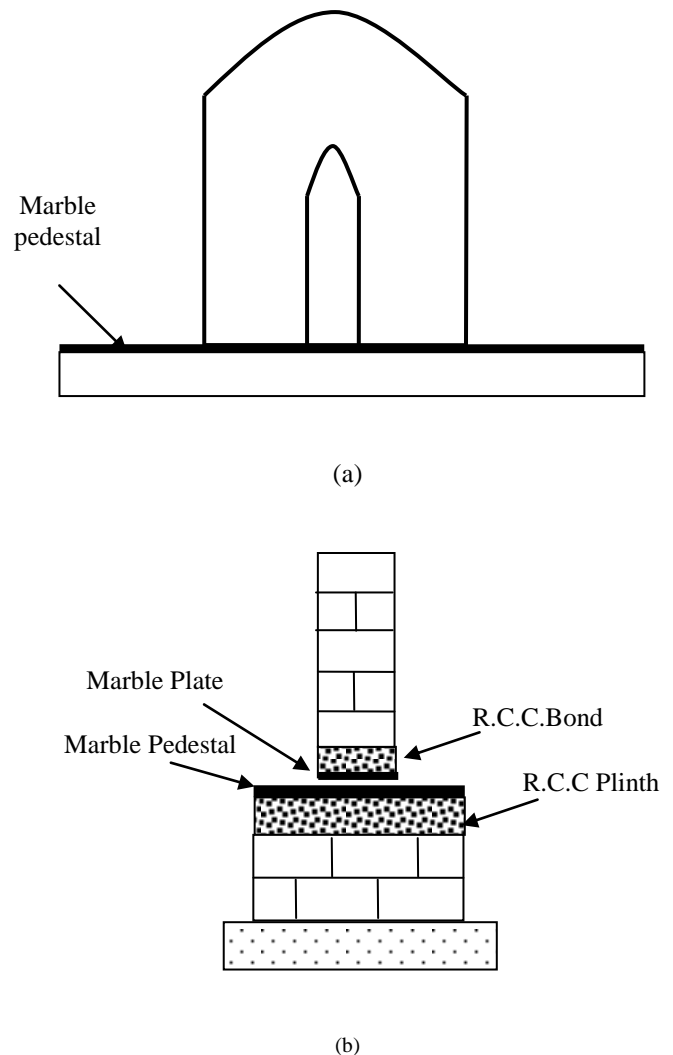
Construction detail for frictional base-isolation system for architectural temples with (a) large marble pedestal and (b) wall section.
